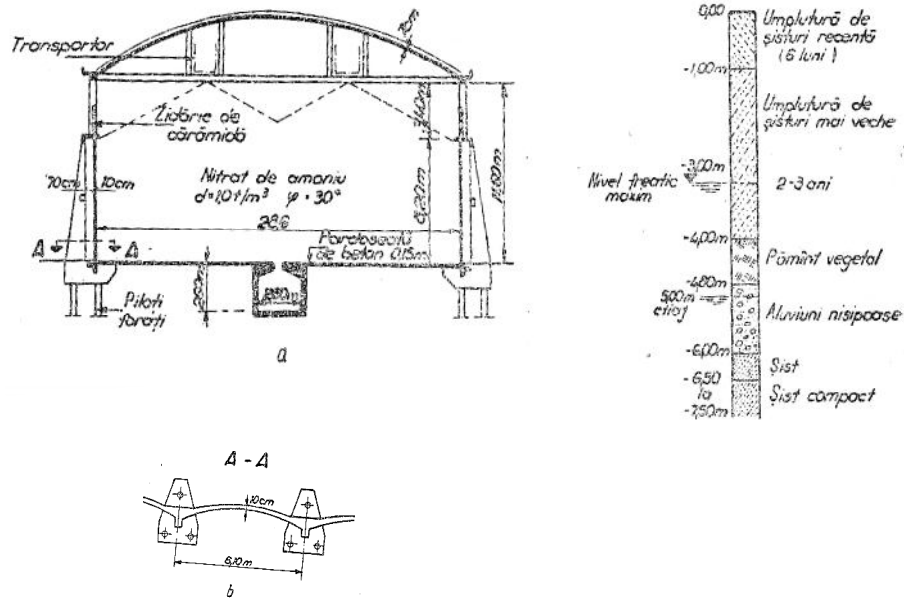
Grain storehouse: a cross-section through the storehouse, b-section AA, c-soil stratification
